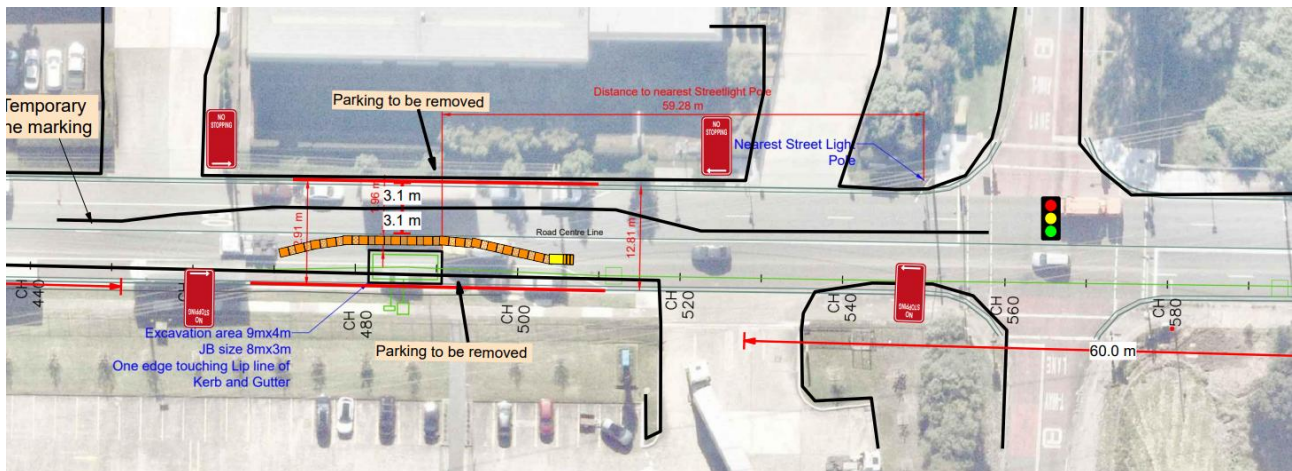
Proposed temporary traffic layout at Davis Road (Stage 3).
